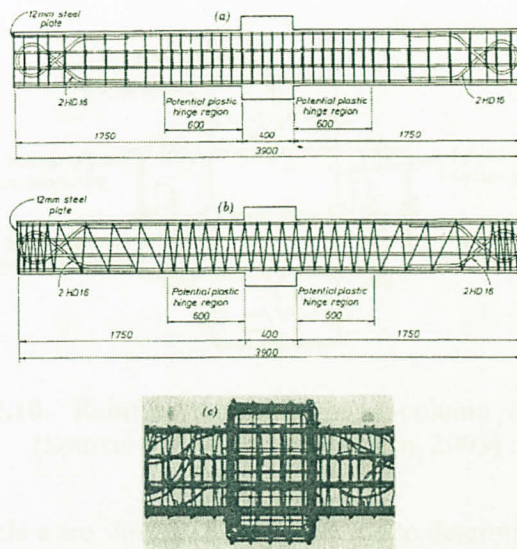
Arrangement of Reinforcement in (a) Square Column Units; (b) Octagonal Column Units; and (c) Central Stub
